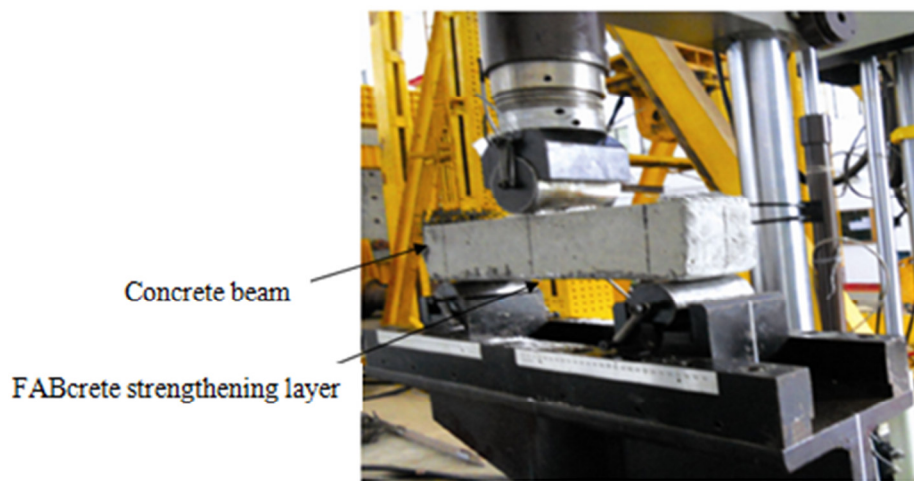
Setup for tests on *FABcrete* strengthened concrete beams
